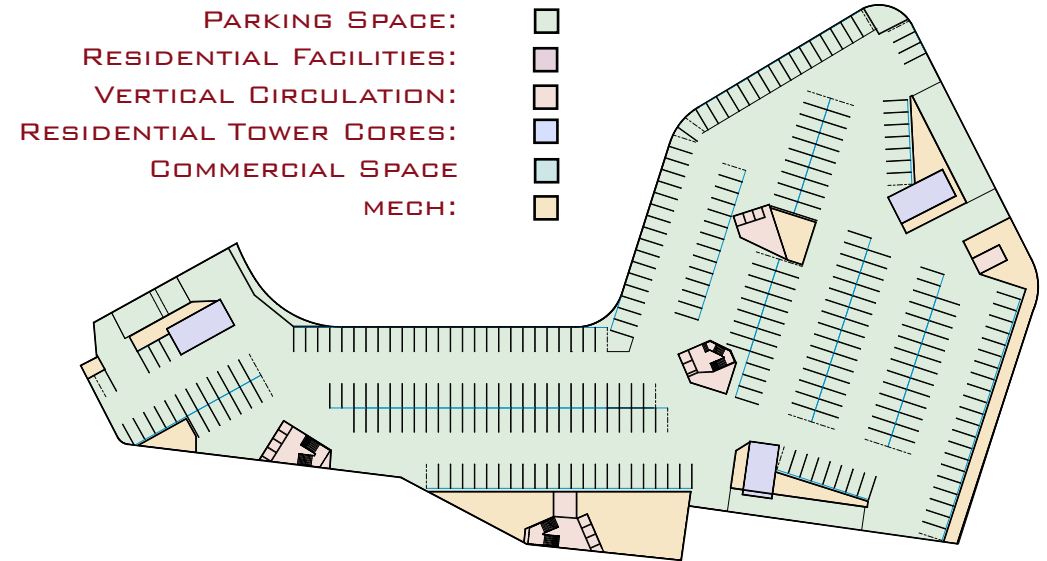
| LEVEL PARKING FLOOR PLAN | DJV
